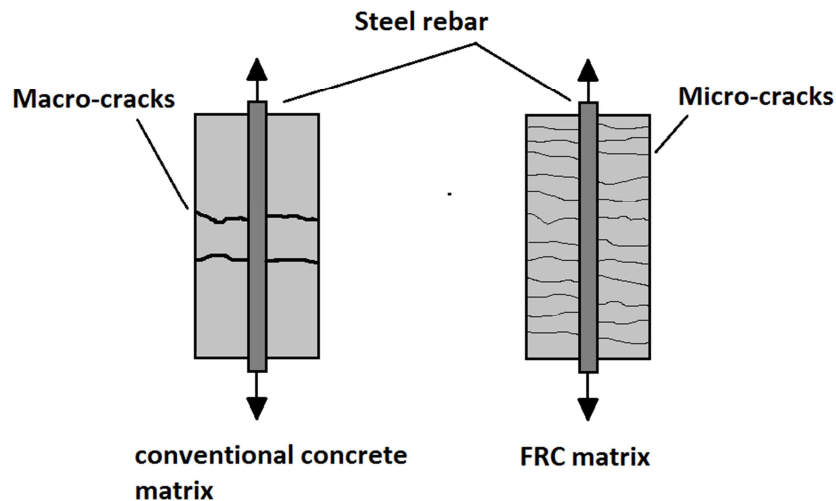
The crack patterns of steel reinforced concrete compared to FRC (Brandt, 2008)
